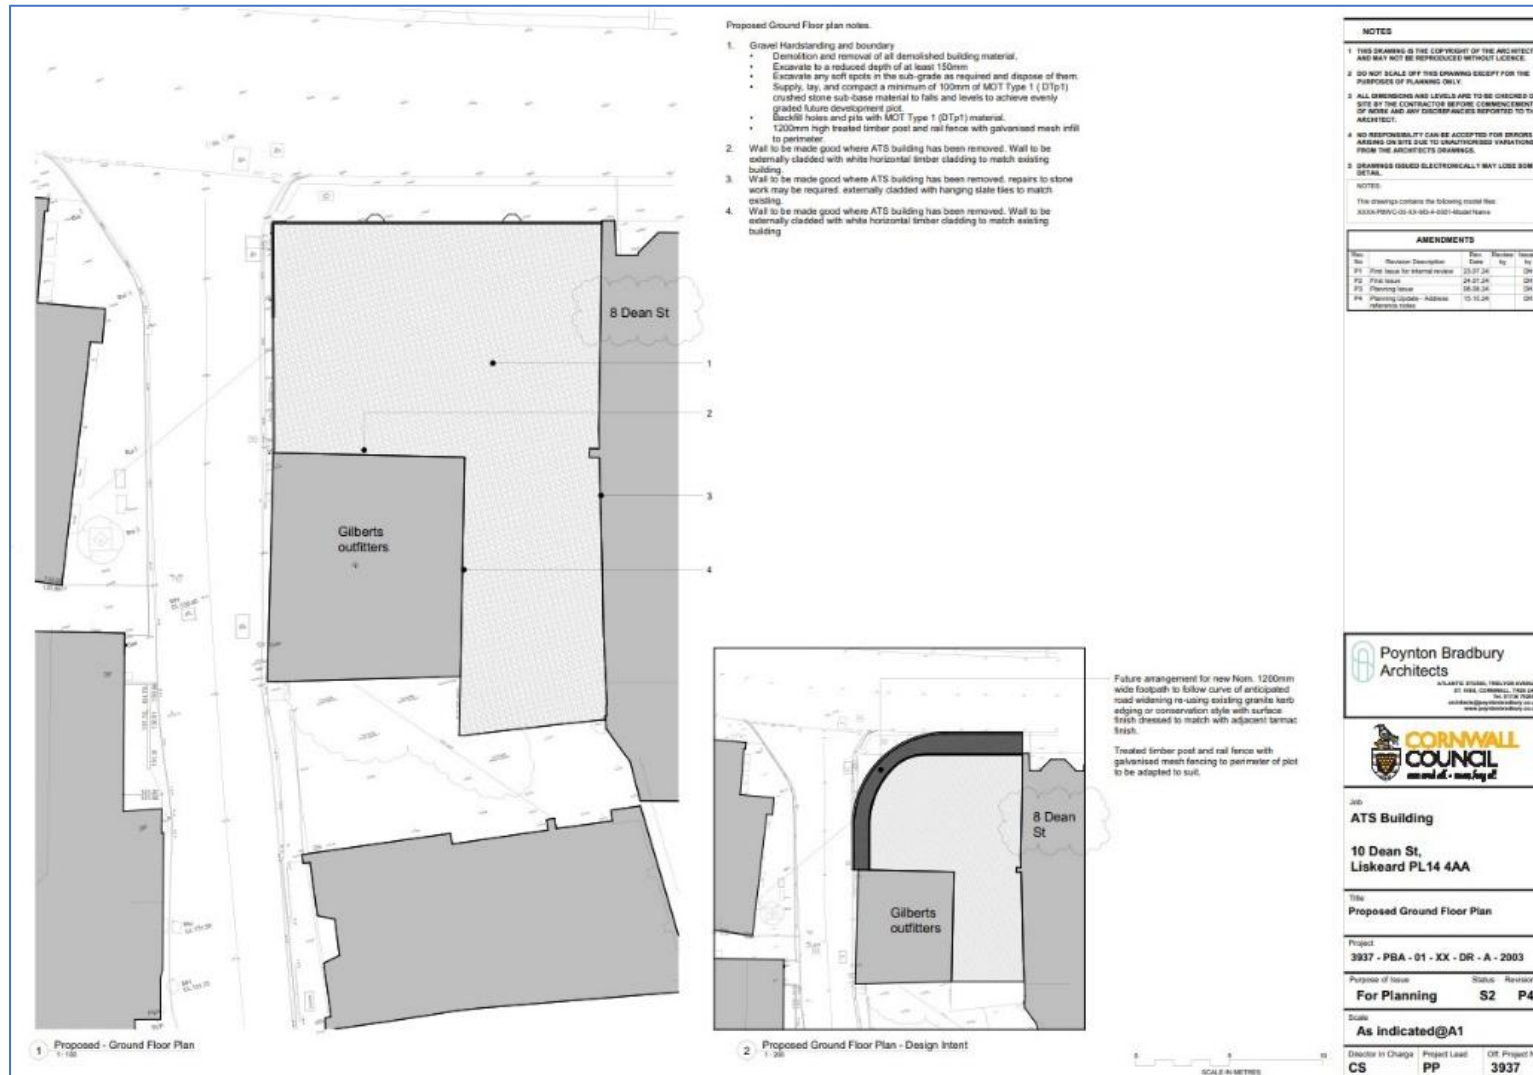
Plan details for the proposed works on the site of the former ATS building, kindly supplied by Cormac Solutions Ltd.
